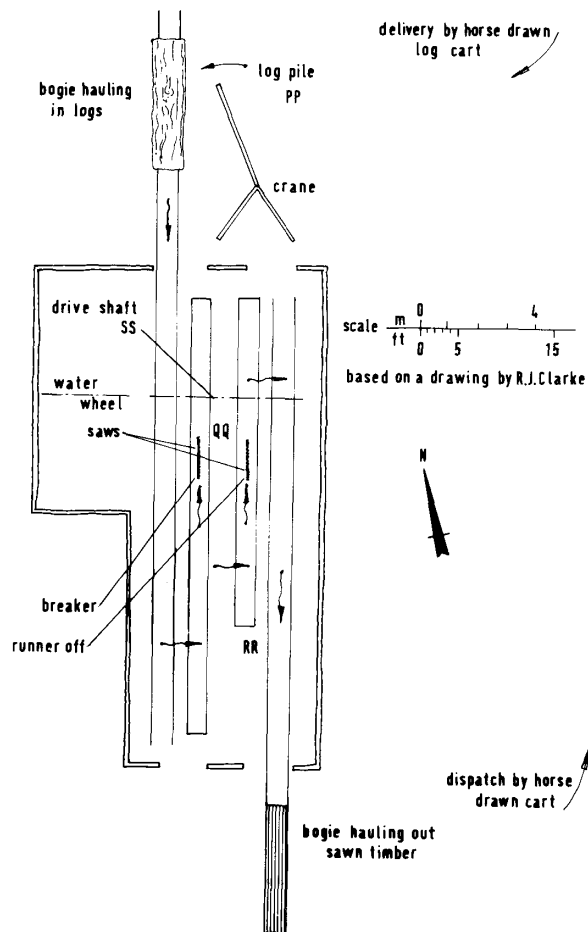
Reconstruction Sketch Plan of Sawing Area.
